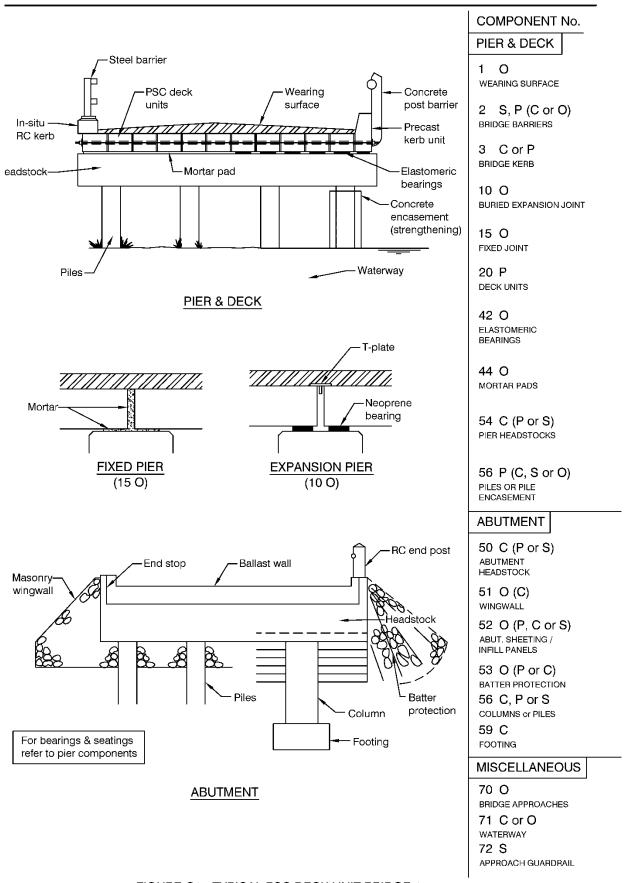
TYPICAL PSC DECK UNIT BRIDGE 1
